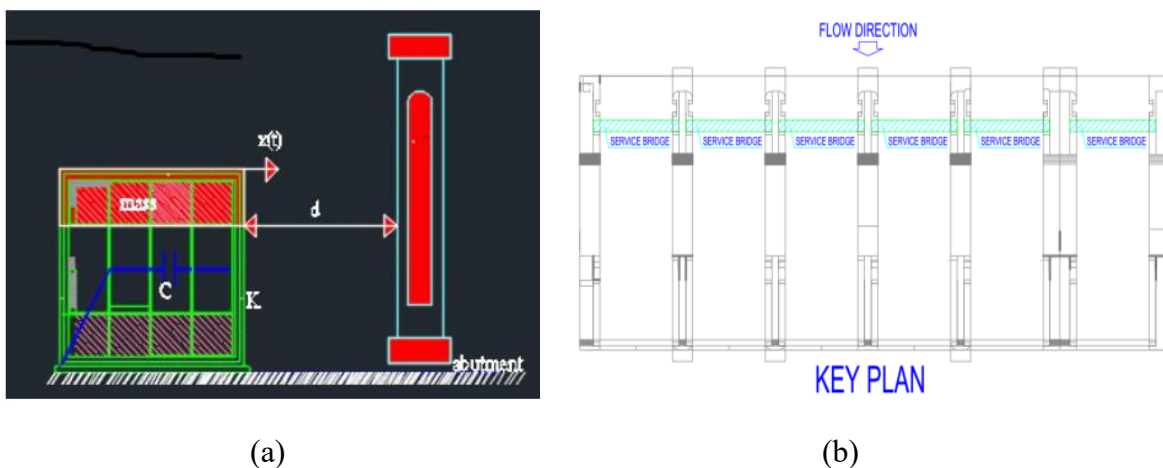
Mechanical model of pounding interaction between structural components and schematic of simply supported bridge girders.
